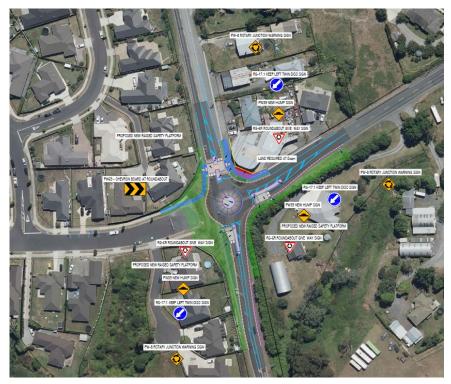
Puketaha/Gordonton Intersection – General Layout Plan – Mini Roundabout Option 3 Legs
